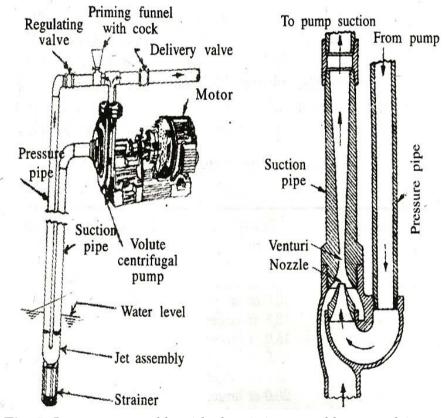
Jet pump assembly with electric jet assembly motor driven centrifugal pump
